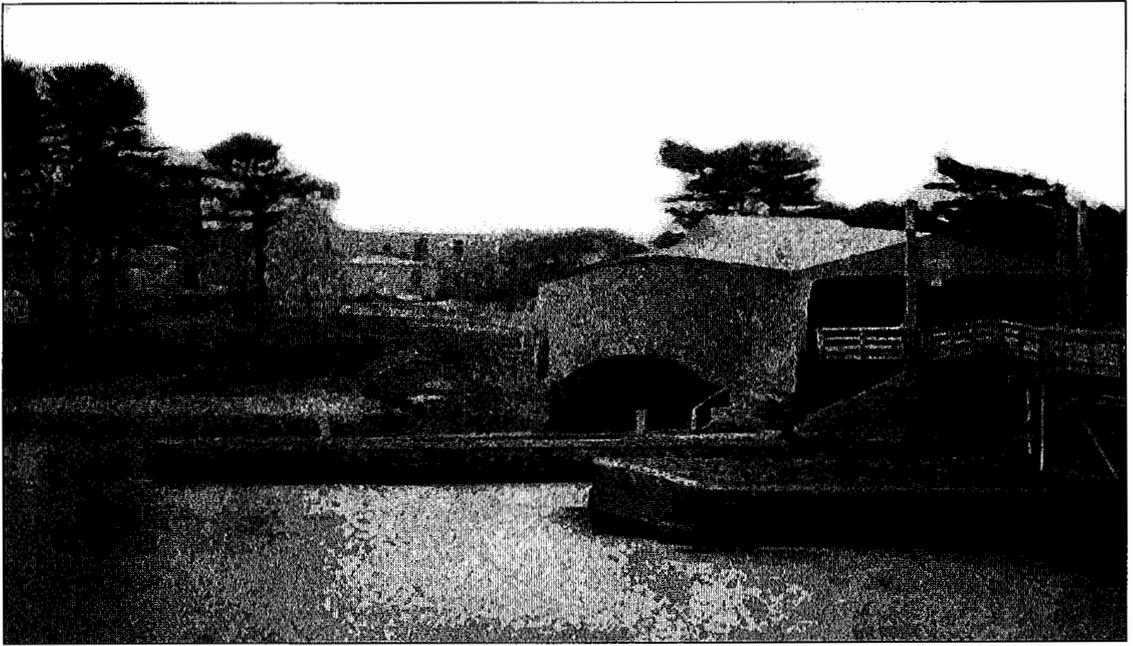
The Salisbury Truss, post-1808, with lift span, looking south.
